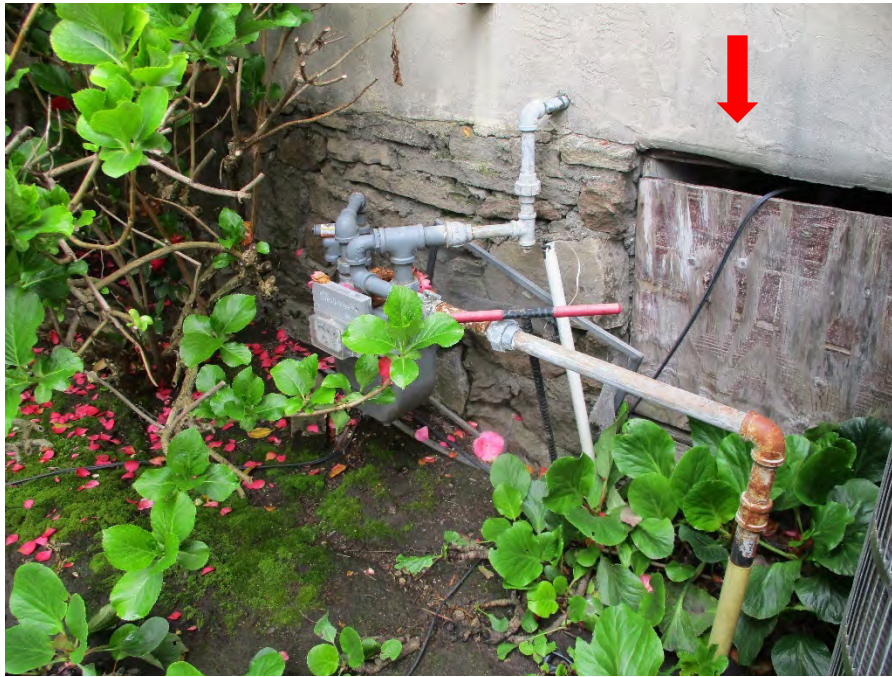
Photo showing the stone foundation, as well the boarded up basement window.
